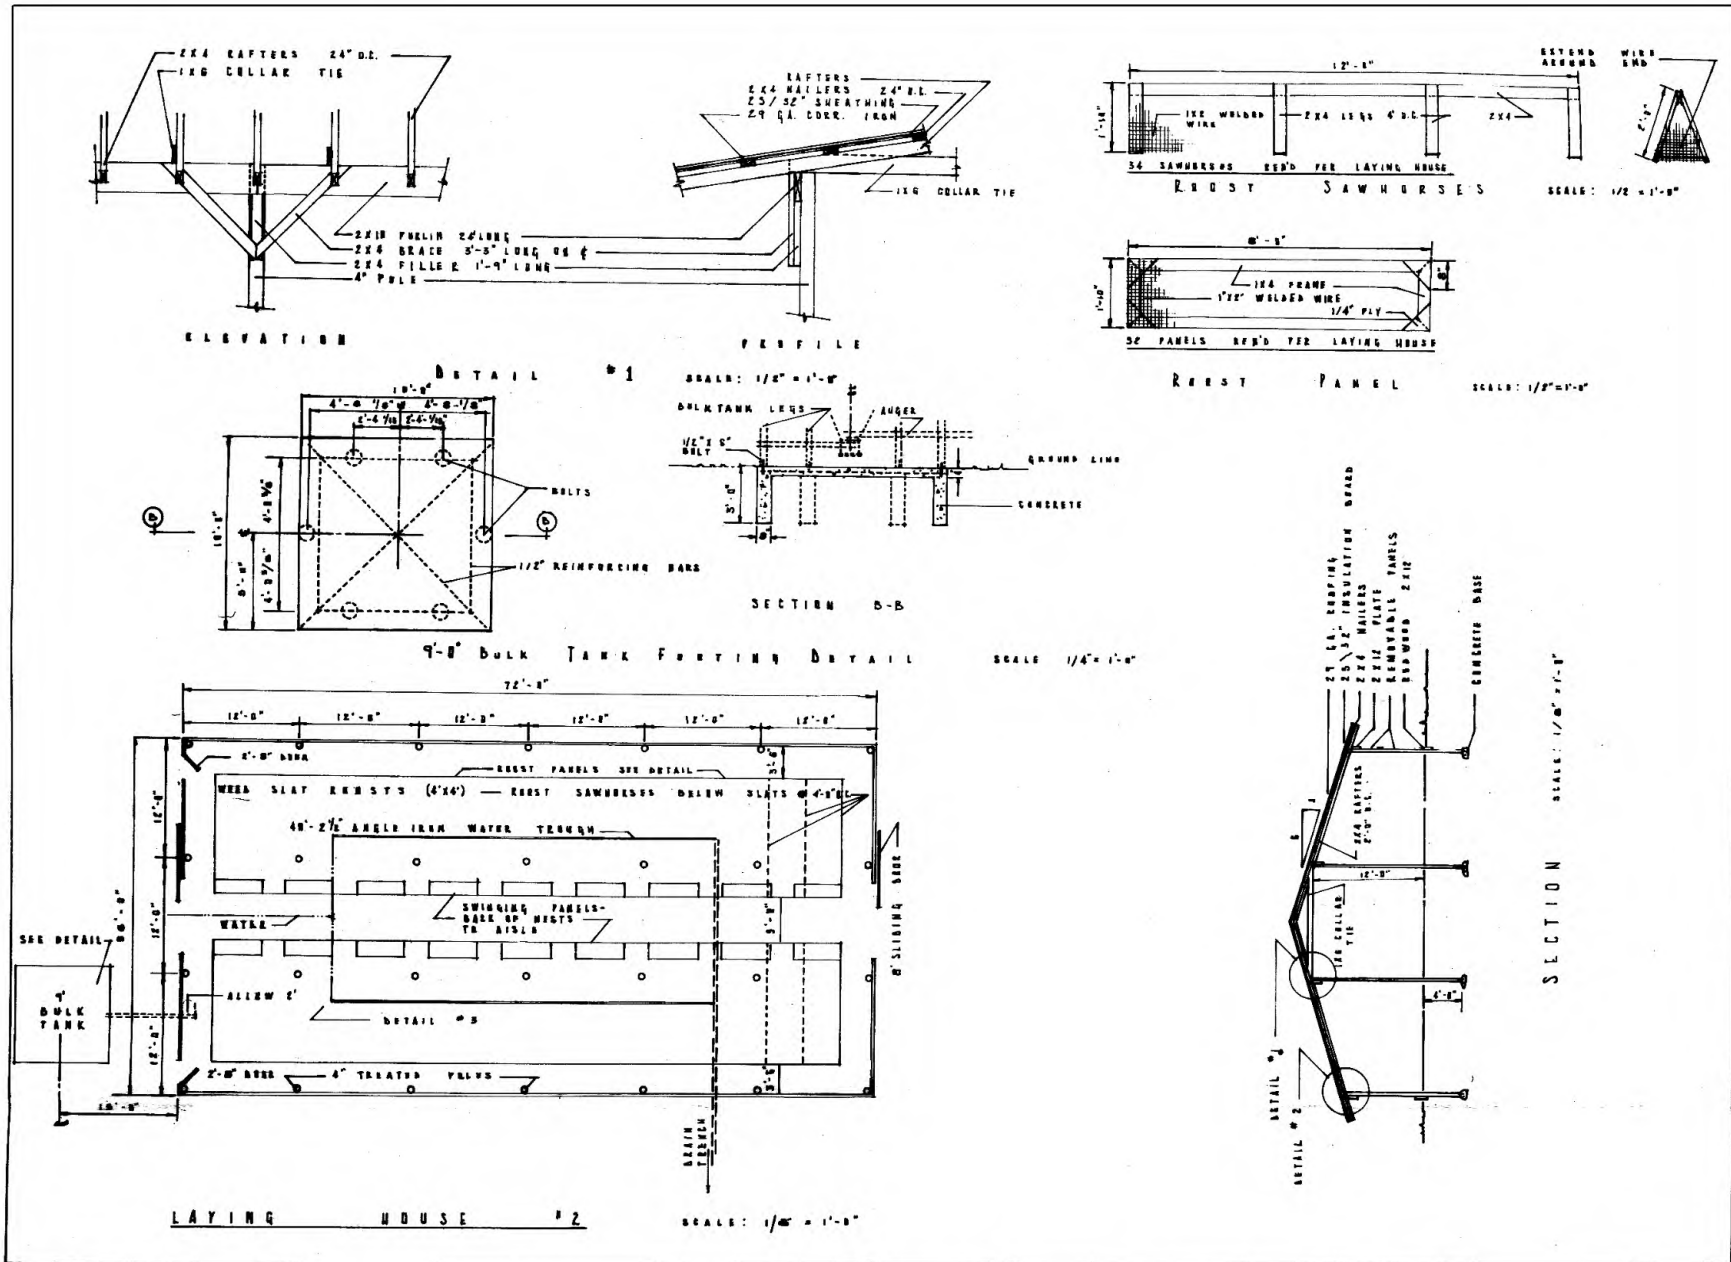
C. Plans for the 36' x 72' Kansas pole-type poultry houses and equipment.
